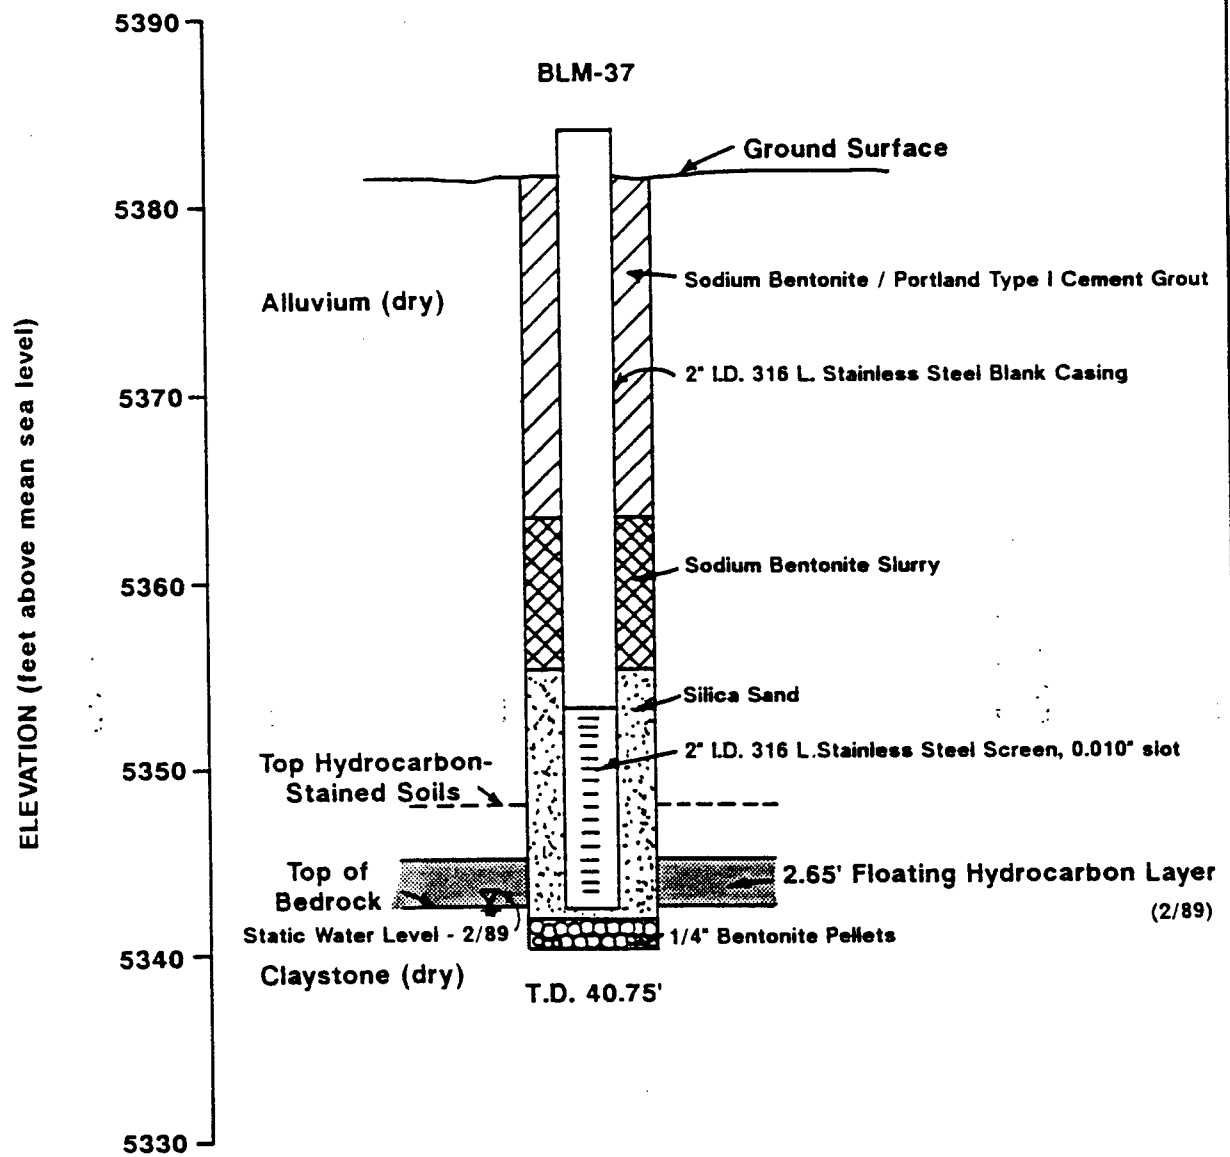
SCHEMATIC OF BLM-37 WELL CONSTRUCTION -
